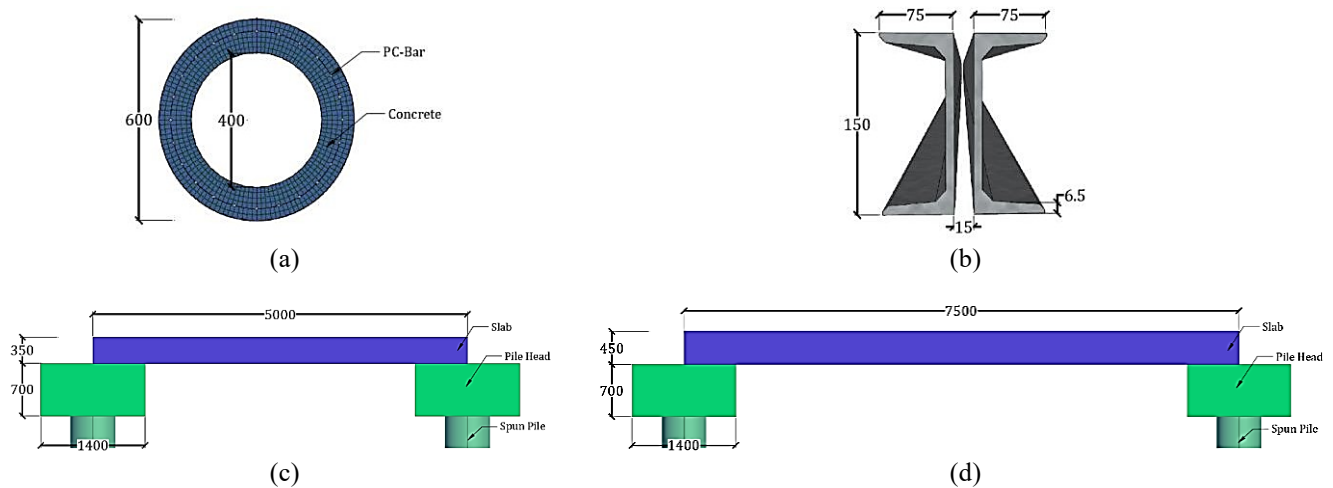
Section Properties: (a) Spun Pile; (b) Double UNP; (c) Detail SOP Span 5000 mm; (d) Detail SOP Span 7500 mm. (unit in mm)
